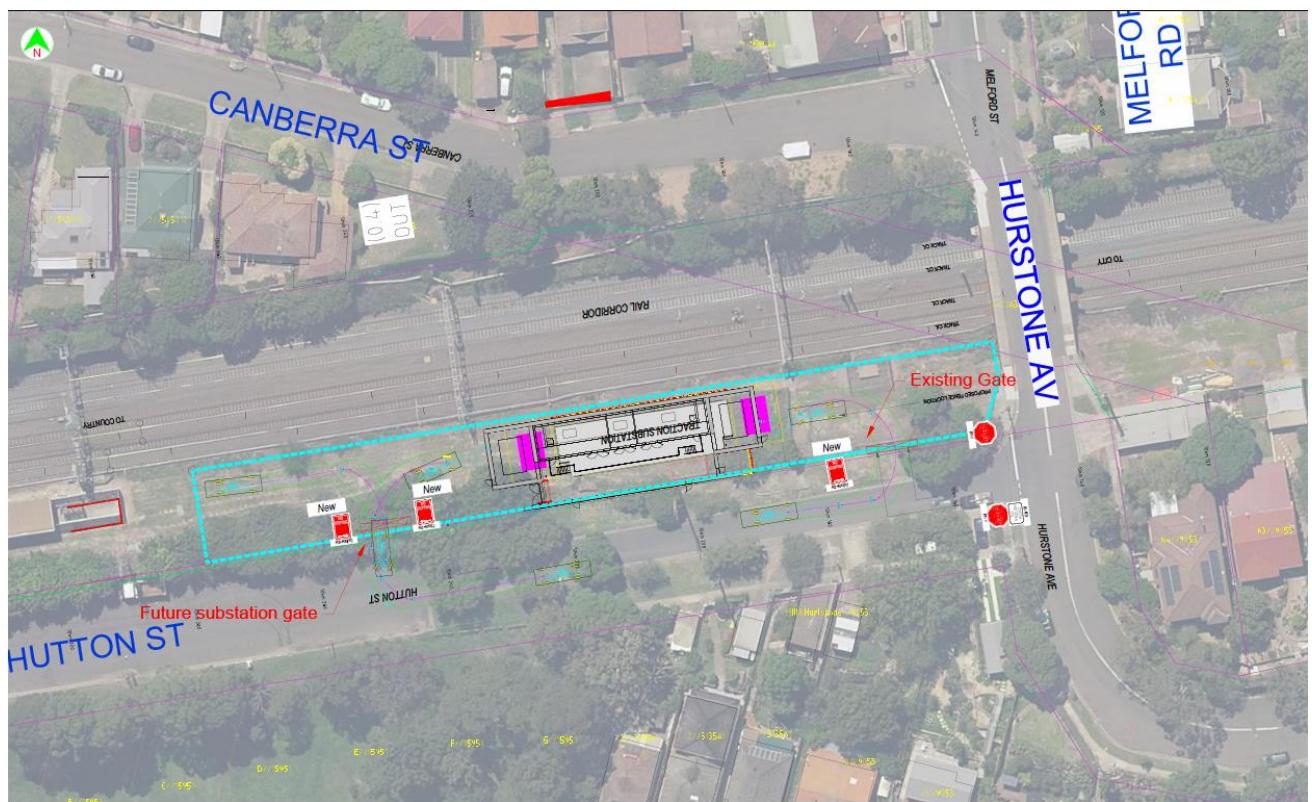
Canterbury traction substation site access (refer to Appendix A for details)
